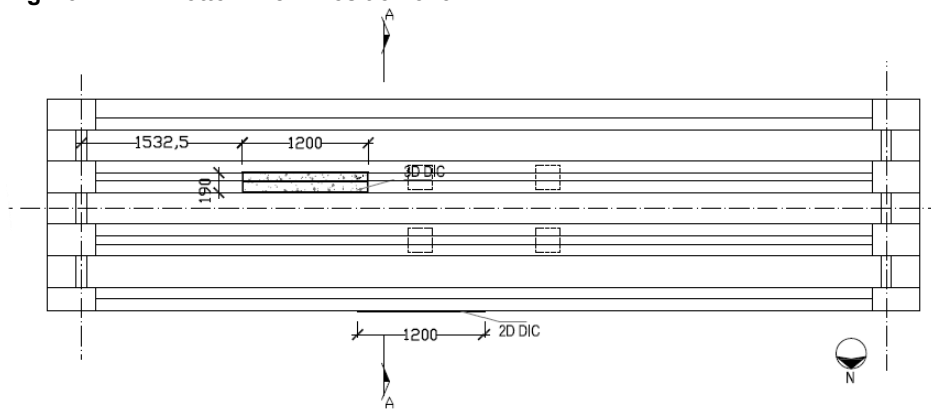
LB3 - Bottom view. Position of 3D DIC.
